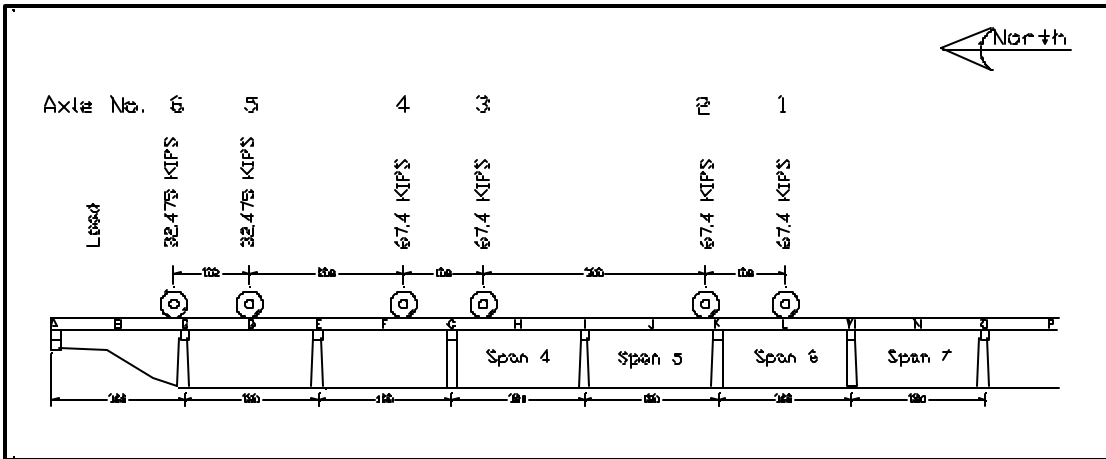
Loads applied to Bridge 32.35 due to load position 1@L. Dimensions are in inches.
